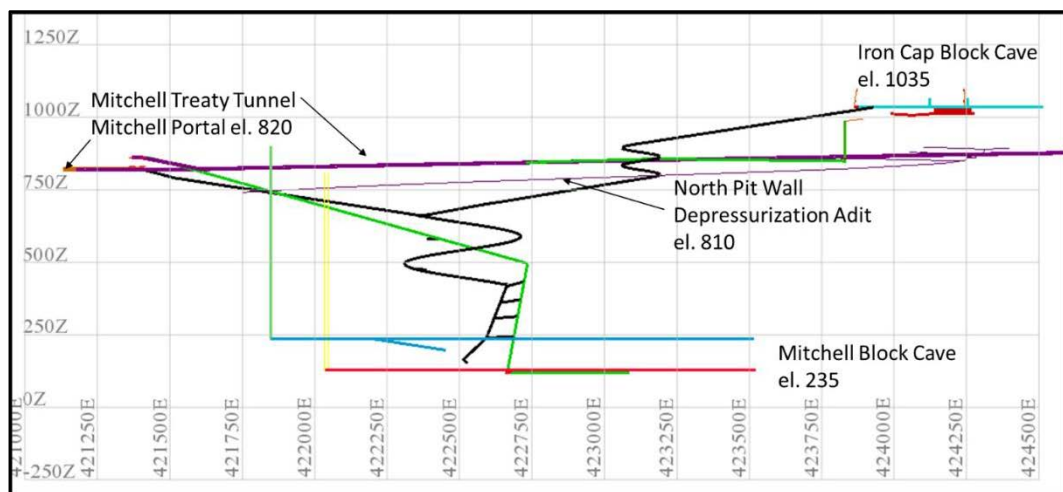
Section View of the Mitchell and Iron Cap Block Cave Mines (Looking North)
